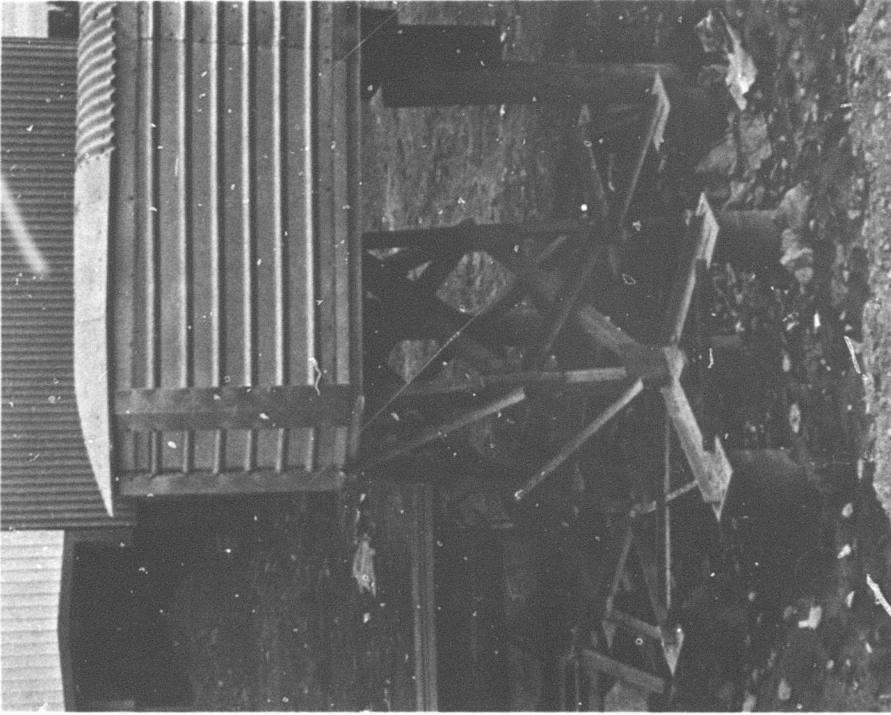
Anchor on 6-inch well casing. All fabrication done on site.
